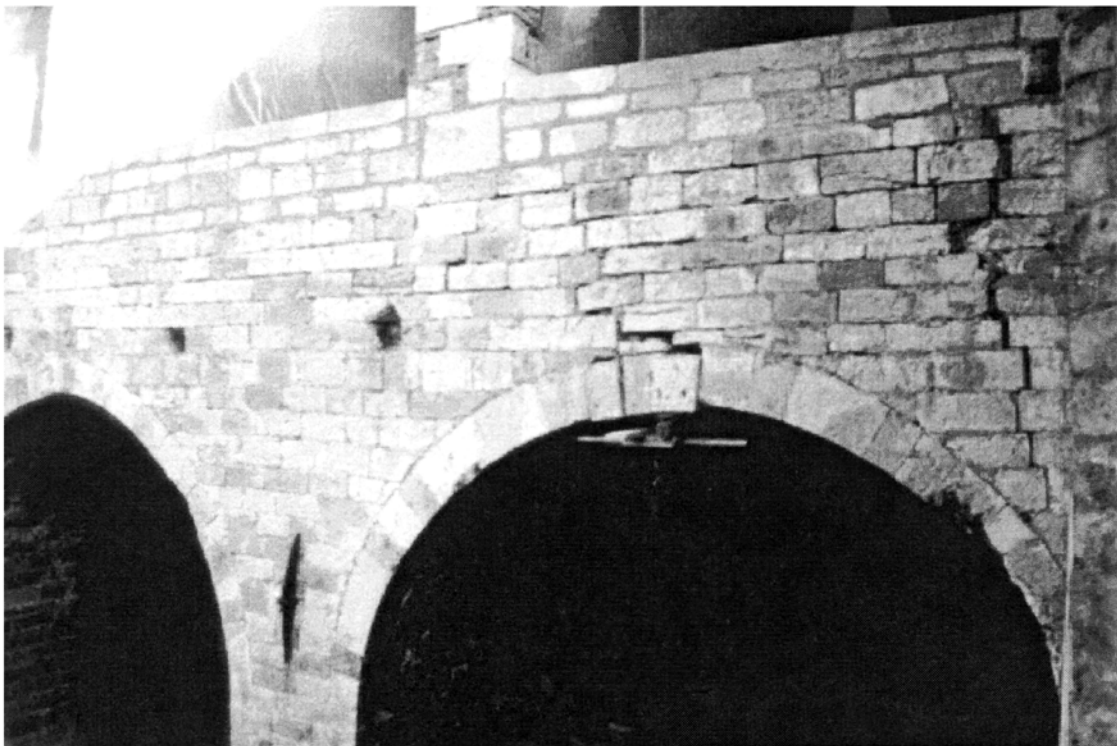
Santa Chiara Convent: arch collapse on the cloister south front
